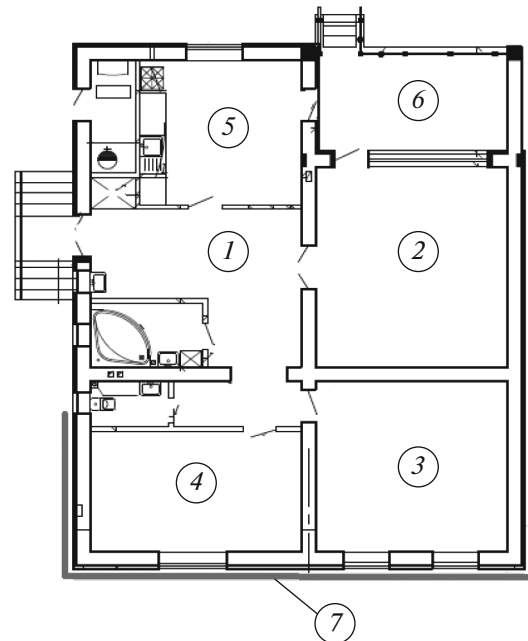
Typical three-room residential building. (1) Entrance hall; (2) common room; (3) parents' bedroom; (4) bedroom; (5) kitchen; (6) iwan; (7) Trombe wall.
